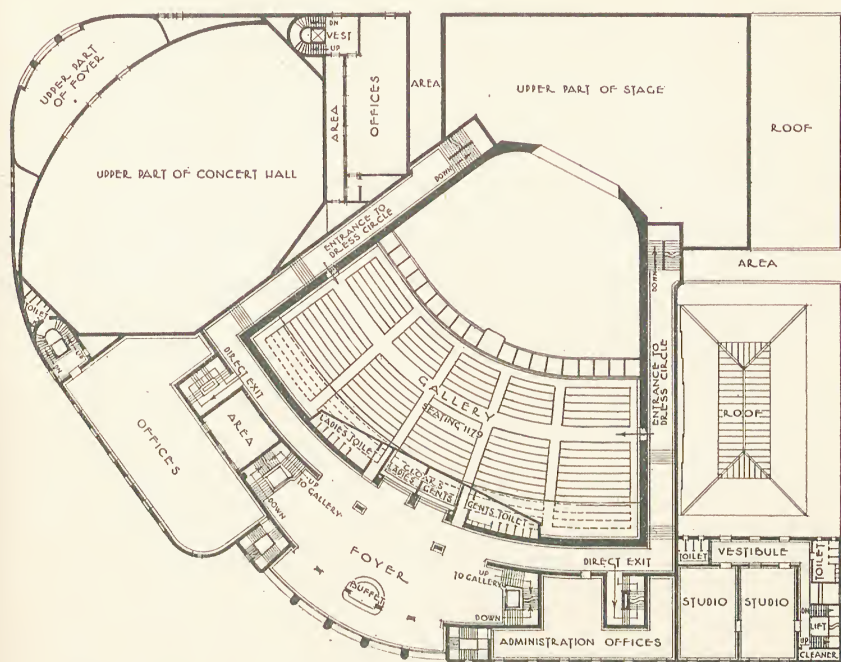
SECOND-FLOOR PLAN OF PROJECT FOR IMPERIAL MUSIC CENTRE
